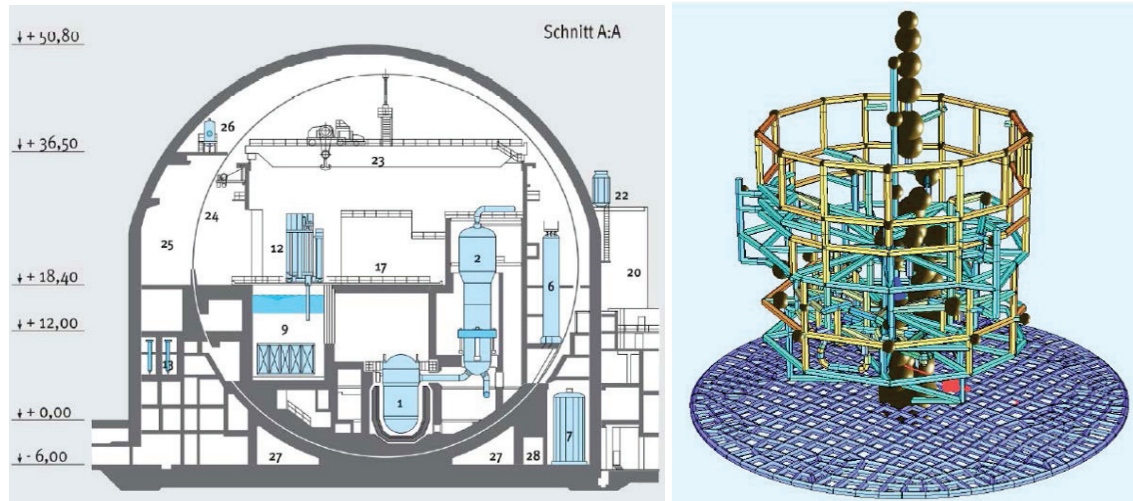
Reactor building – section (left) and beam model with rigid foundation slab (right)
